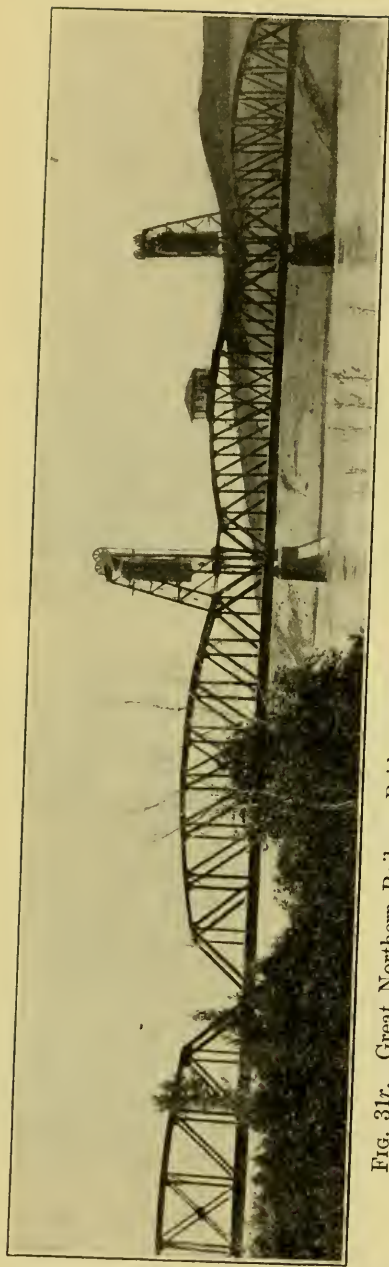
Great Northern Railway Bridge over the Yellowstone River, Montana.—Lifting Span Down.
